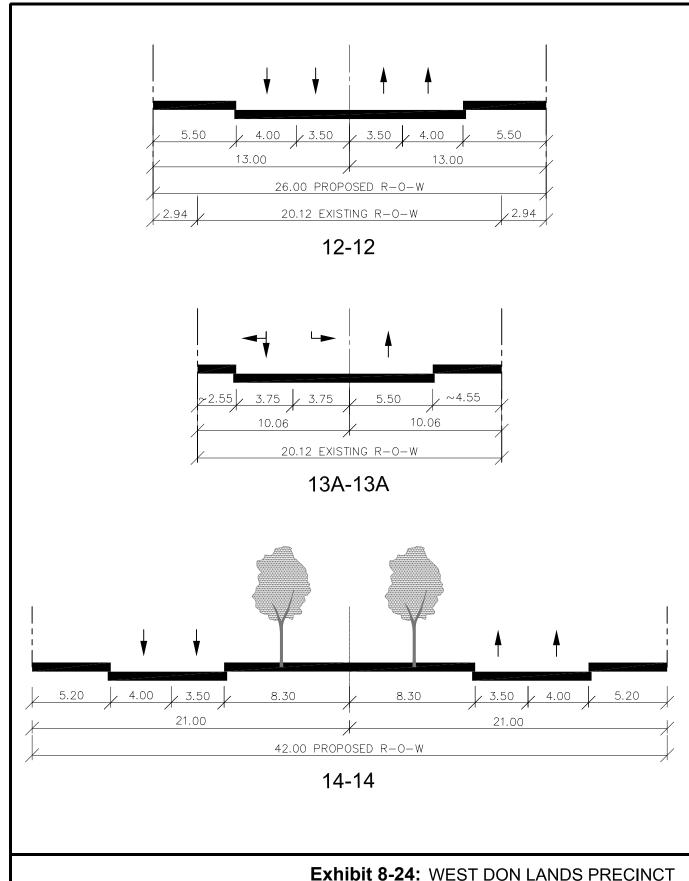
WEST DON LANDS PRECINCT FRONT STREET WITHOUT STREET CAR LINE CROSS-SECTIONS 12-12 TO 14-14
